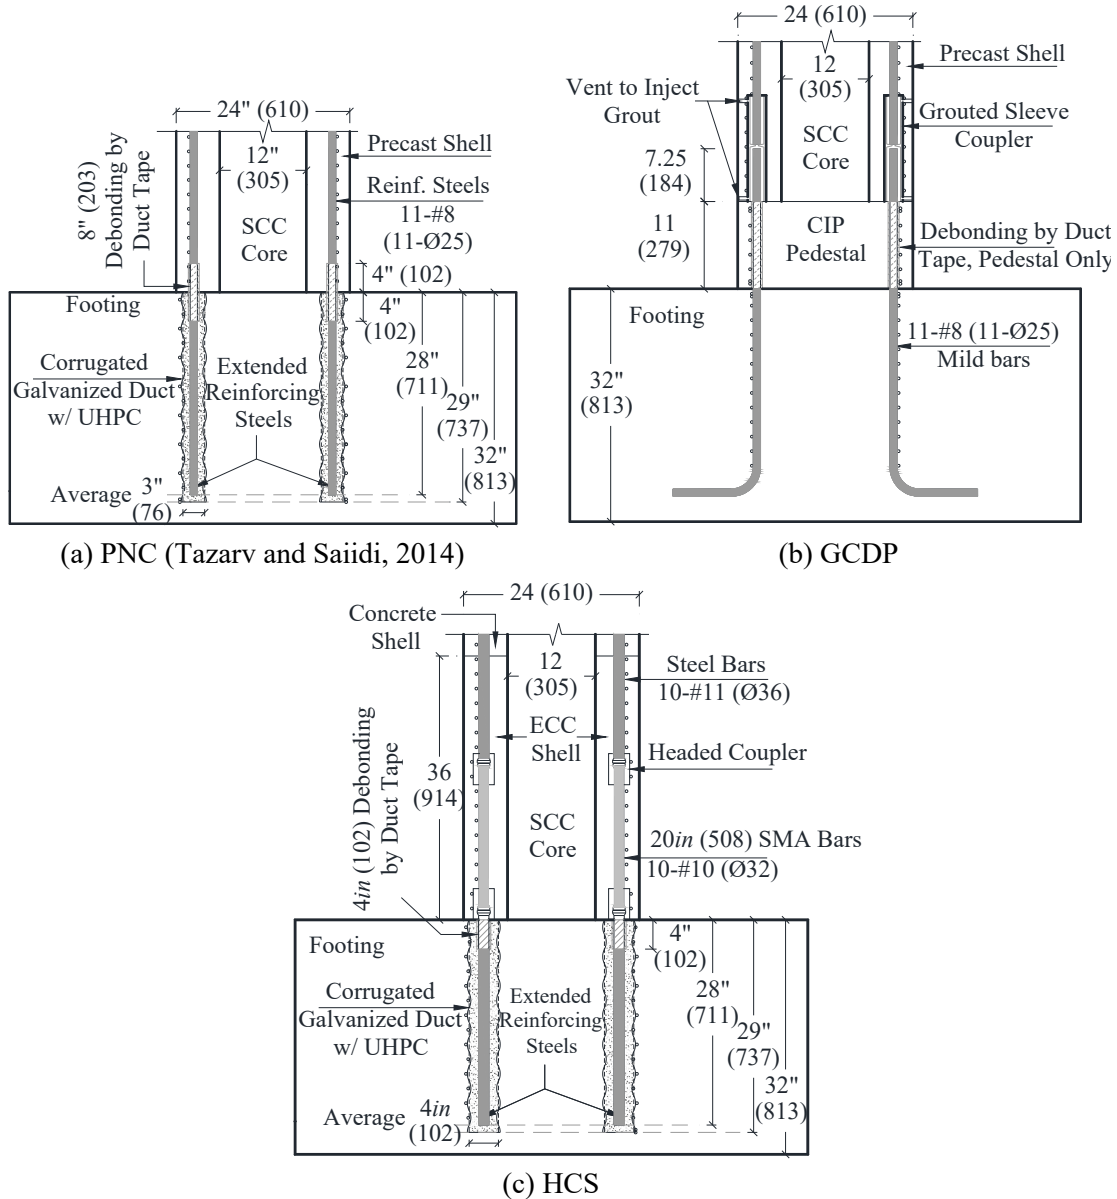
Proposed Base Connection Details for Precast Columns, unit: in. (mm)
